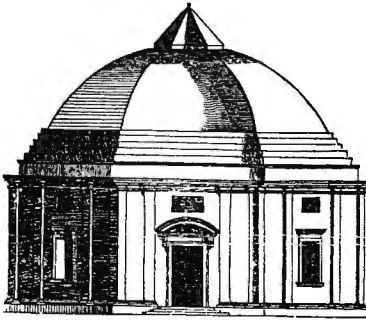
Serlio. Fifth Book: Elevation of a centralized church.
